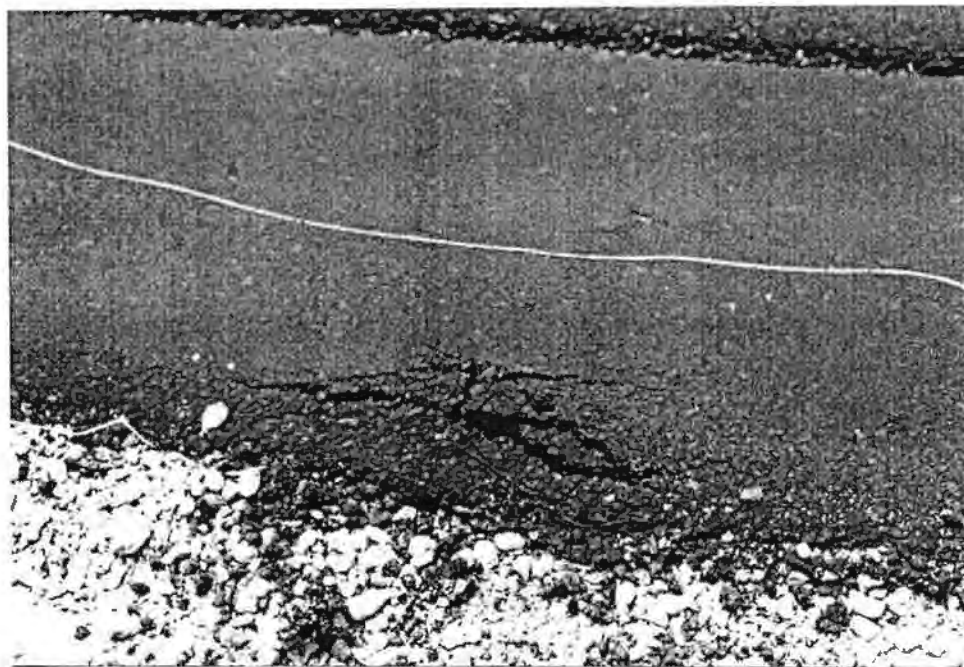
Cracks on the first lift of asphalt (2)
